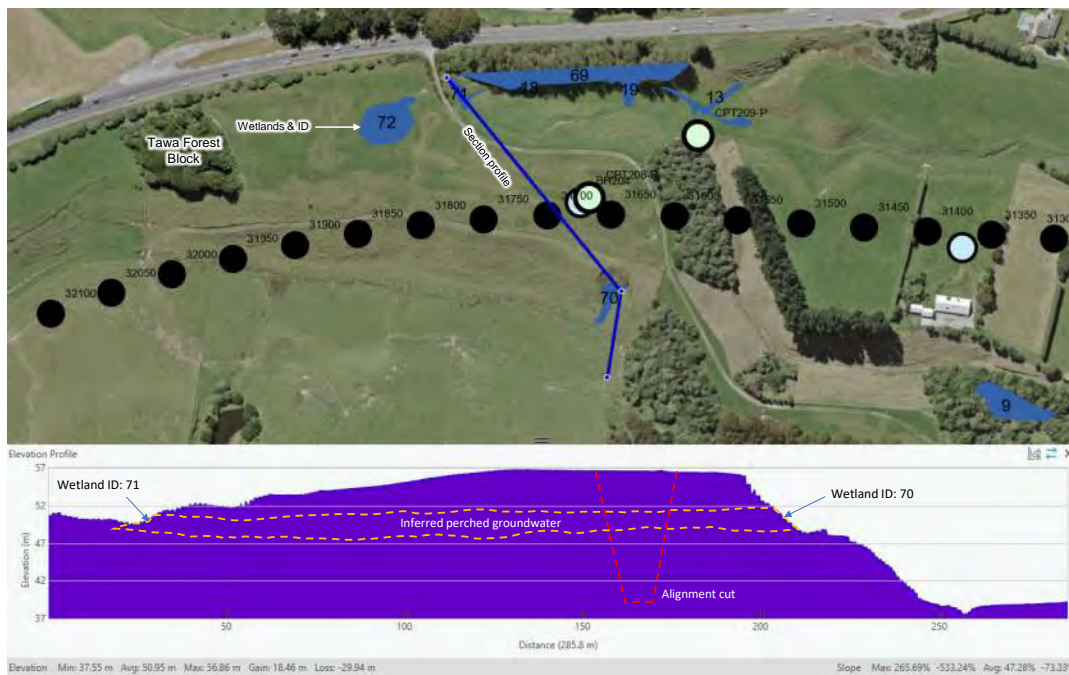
Site E - Cross-section and aerial plan showing alignment cut, interpreted perched groundwater and wetlands
